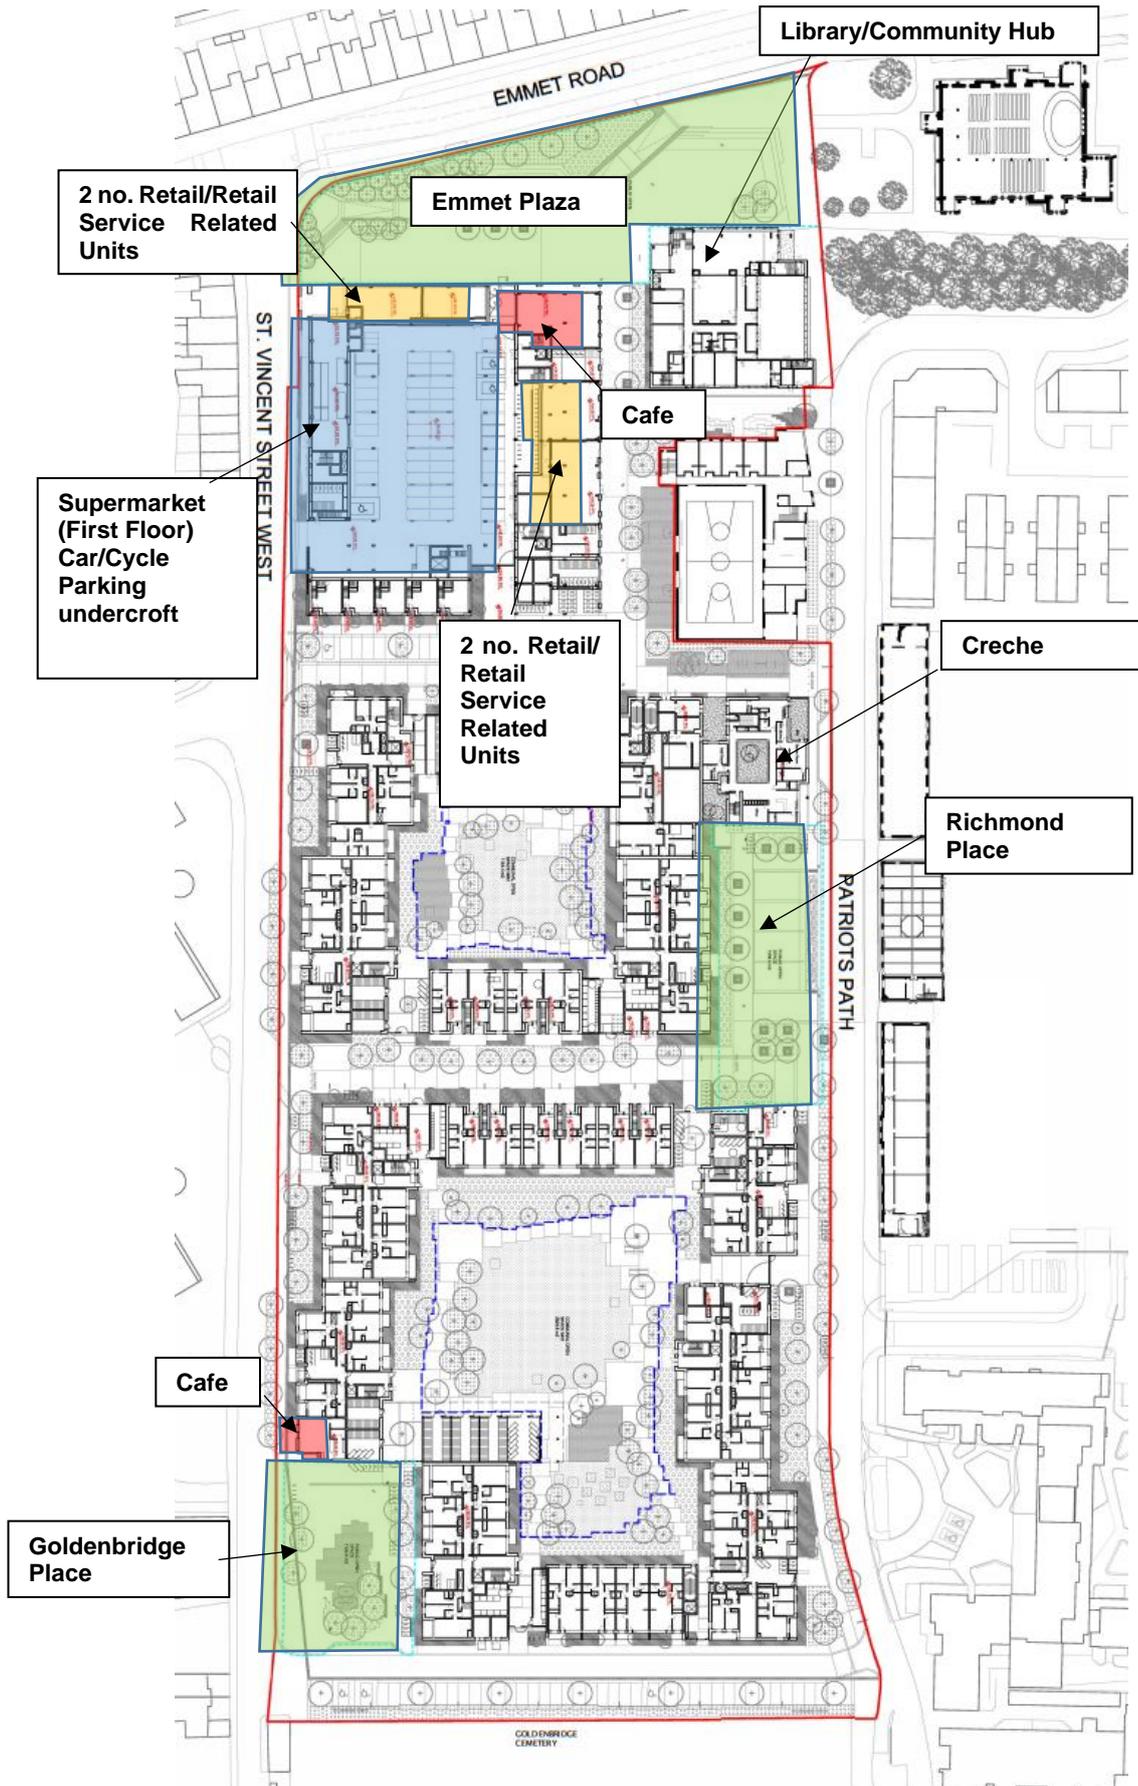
Overall Site Plan Source: Bucholz McEvoy Architects
